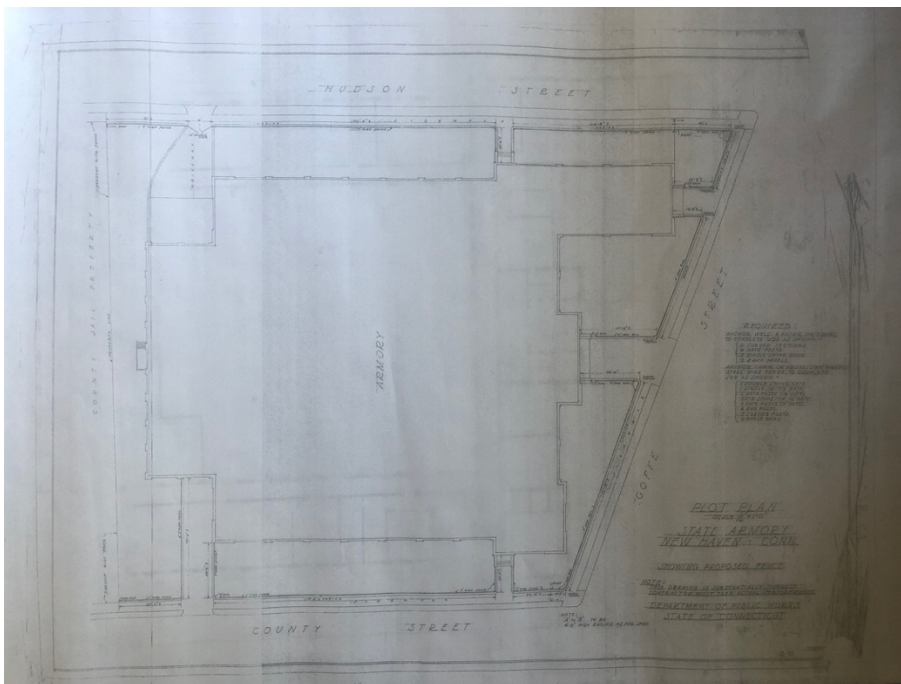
Labeled plan of Building Layout, Sapienza and Lessig Architects and Planners, Bureau of Public Works, State of Connecticut, February 21, 1986.
